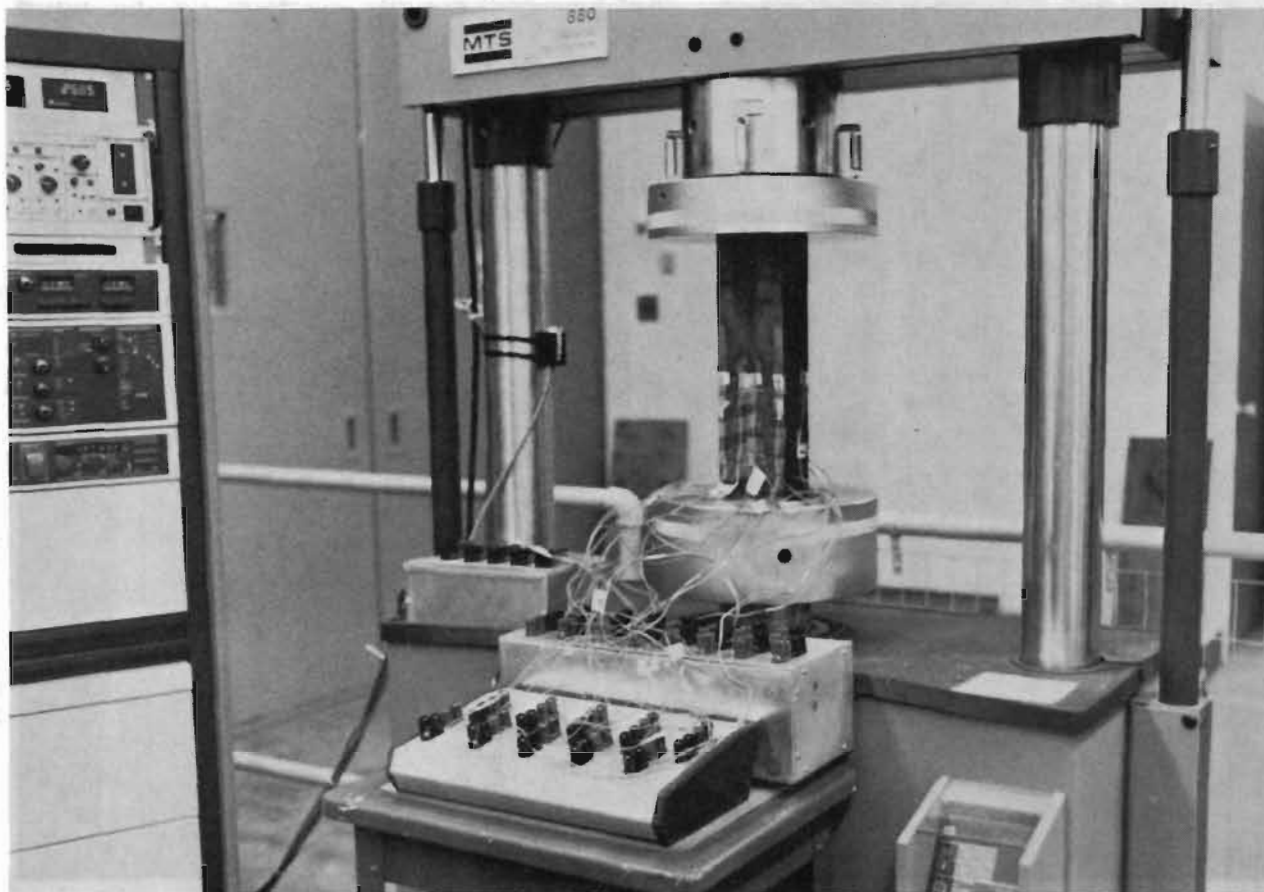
Test Setup of Stub Columns with Unstiffened Flanges
